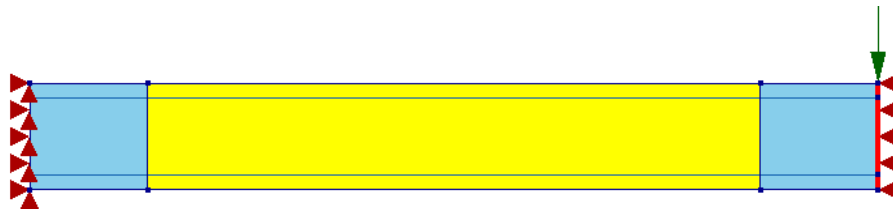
Numerical concrete slab model of Slab 2 with shear reinforcement in DIANA.
